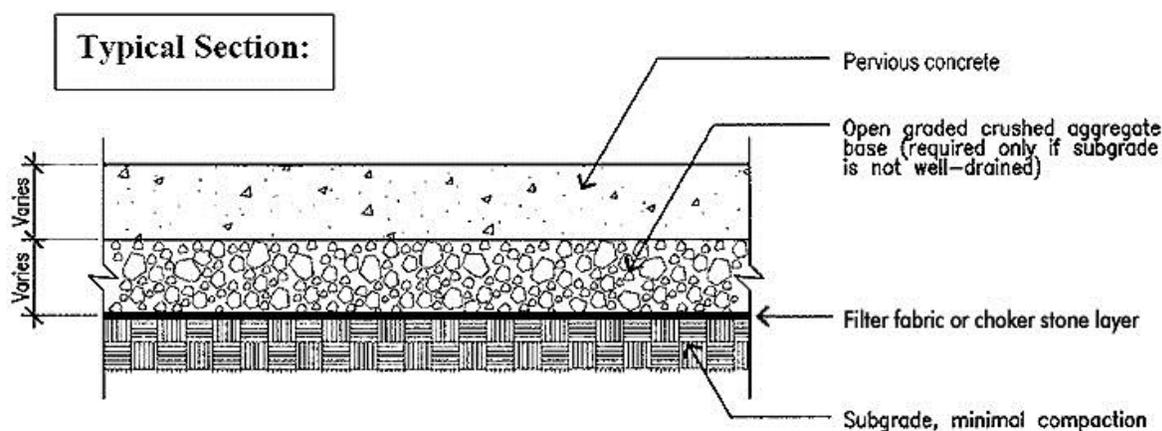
Typical Detail of Pervious Concrete (Source: Portland, 2003)
